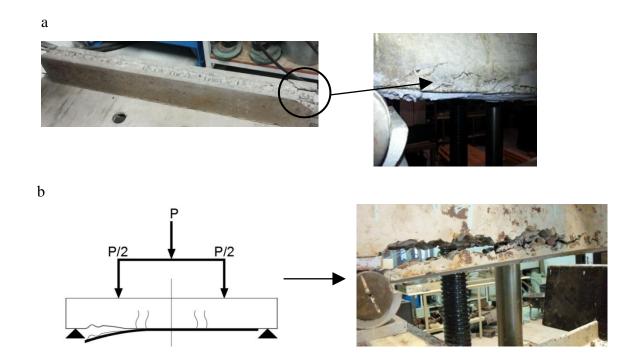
Failure of repaired beams. (a) Support failure (b) Concrete cover separation.
